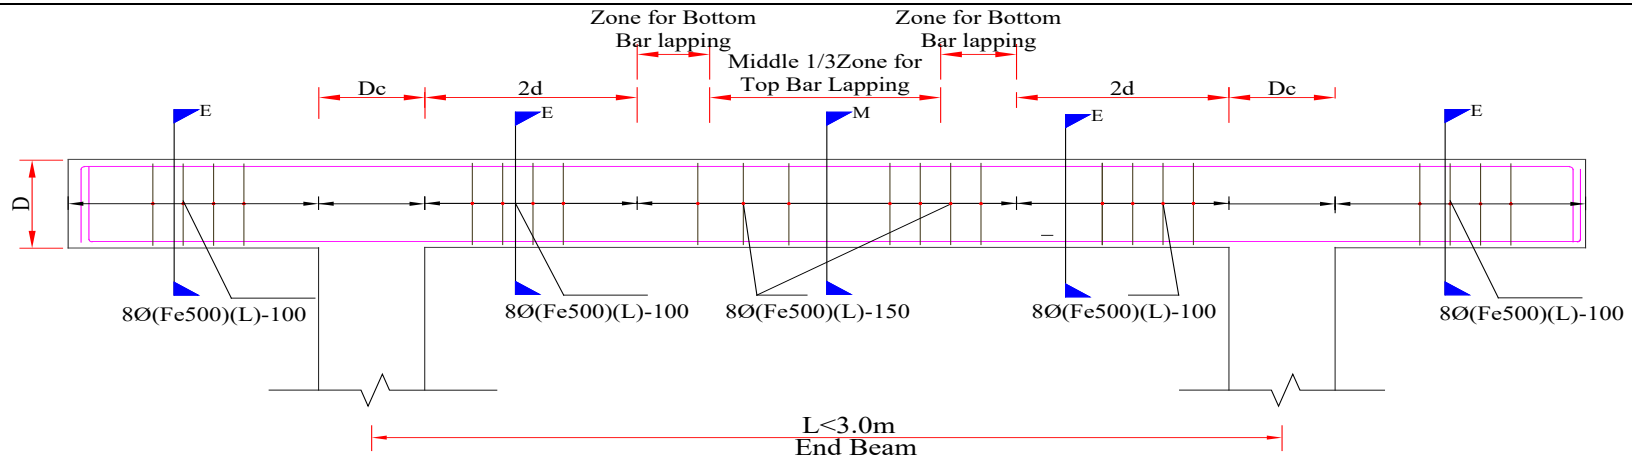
TYPICAL FLOOR BEAM DETAIL OF TWO STOREY BUILDING
